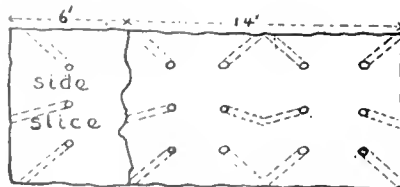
PLAN OF DRILL HOLES IN ROOM MINING
